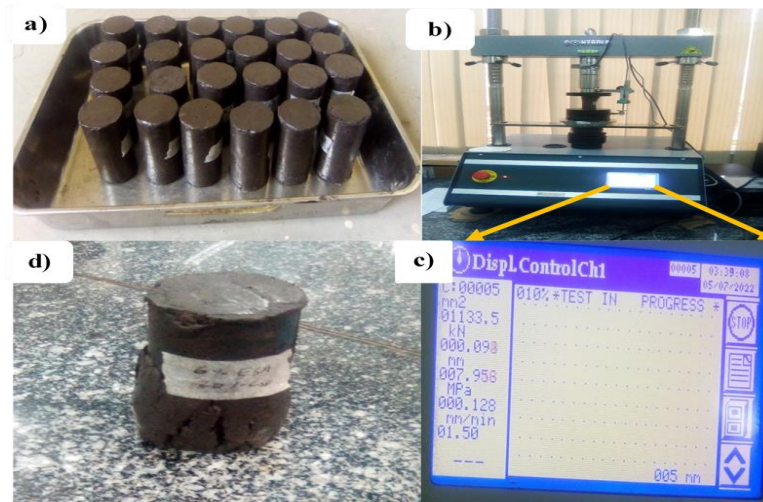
Images of (a) remolded specimens (b) UCS loading machine (c) digital screen of UCS machine (d) specimen after loading
